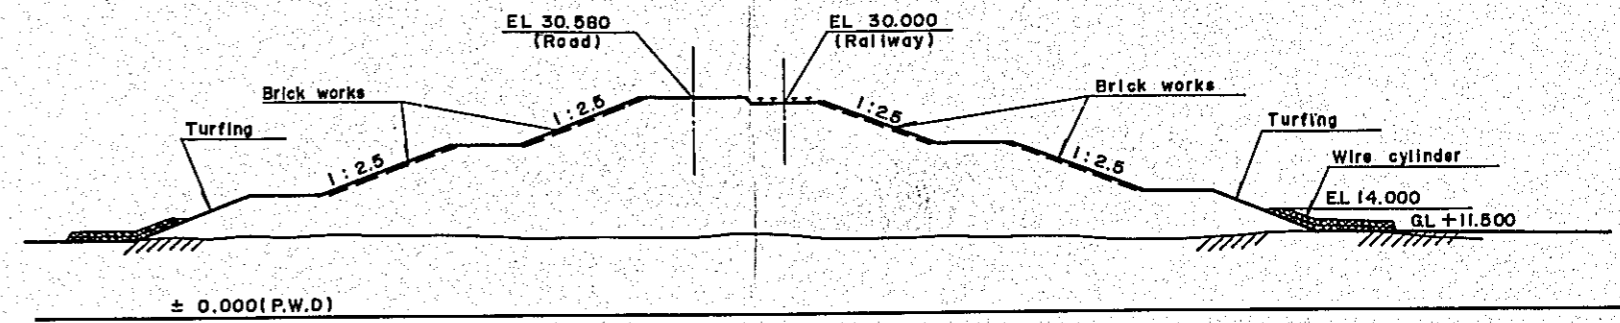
Jamuna Bridge, Railway Links and Road Links
